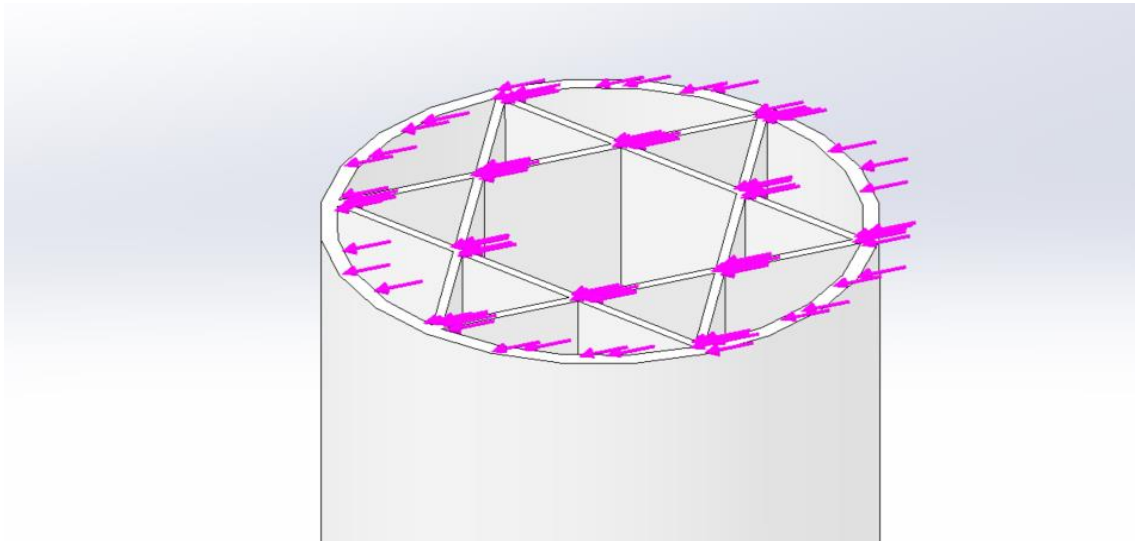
Typical view of 200lb lateral load applied to the top face of the pilings.
